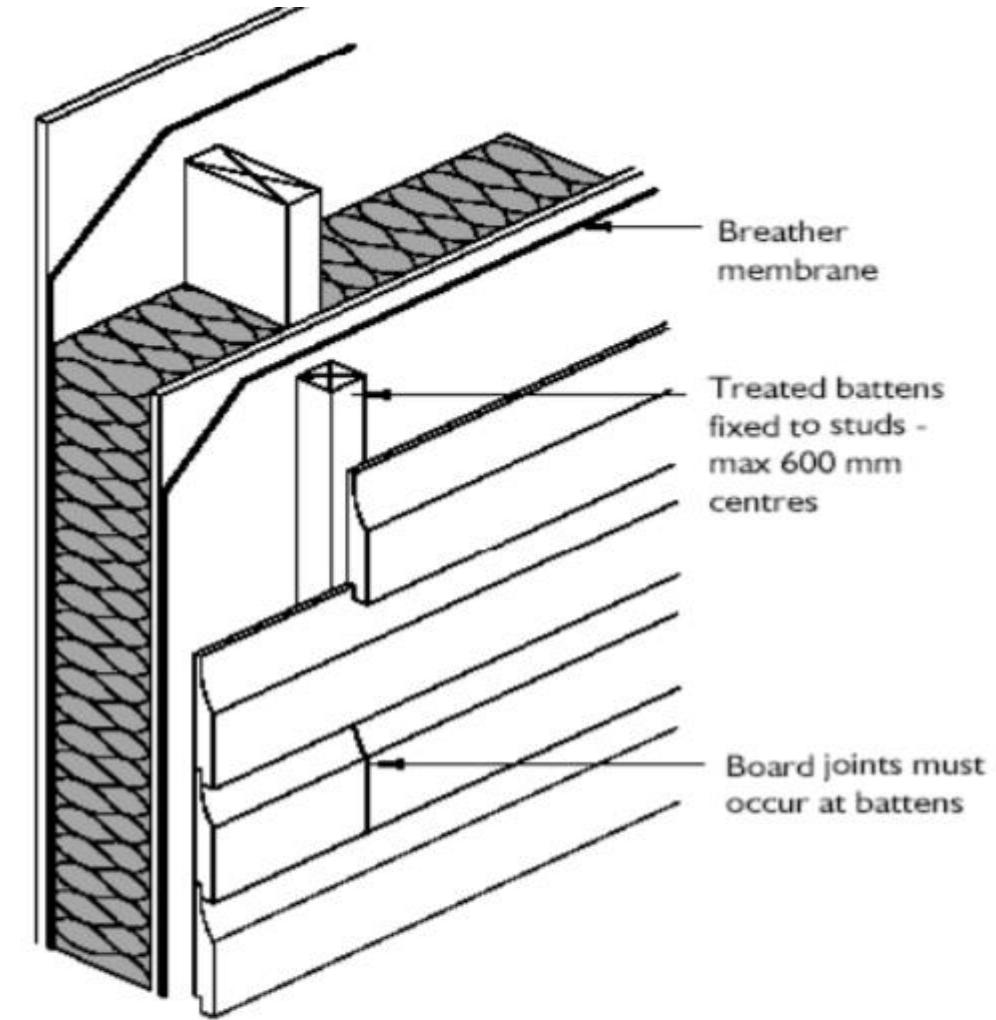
Typical construction: horizontal weatherboarding on vertical timber battens. Note: The drawings show cladding details on conventional timber frame construction. For other forms of construction, the details from the breather membrane out are the same.
